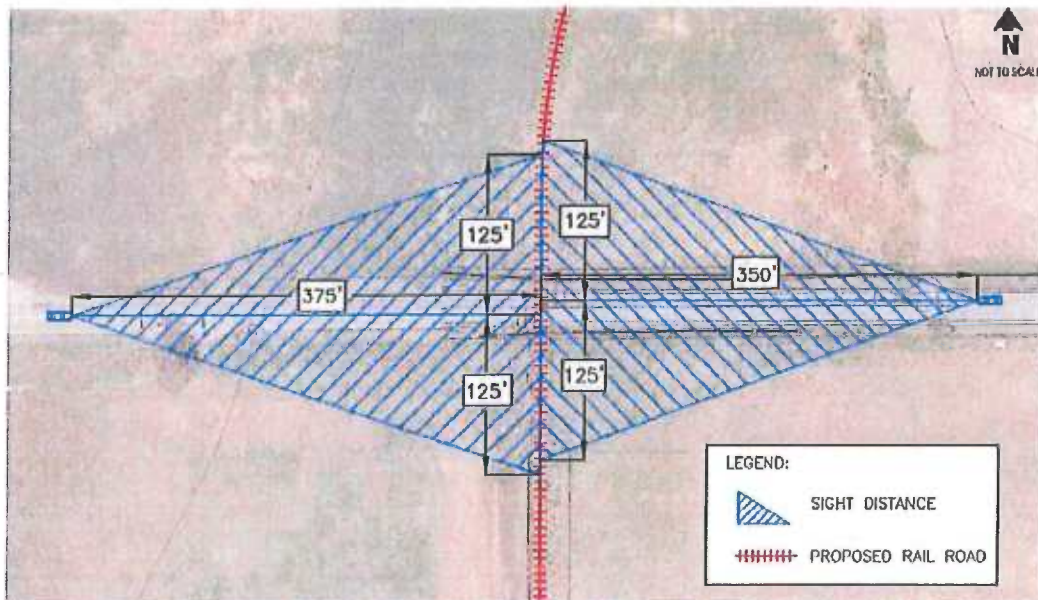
Corner Sight Distance at Proposed Galvin Road Railroad Crossing
